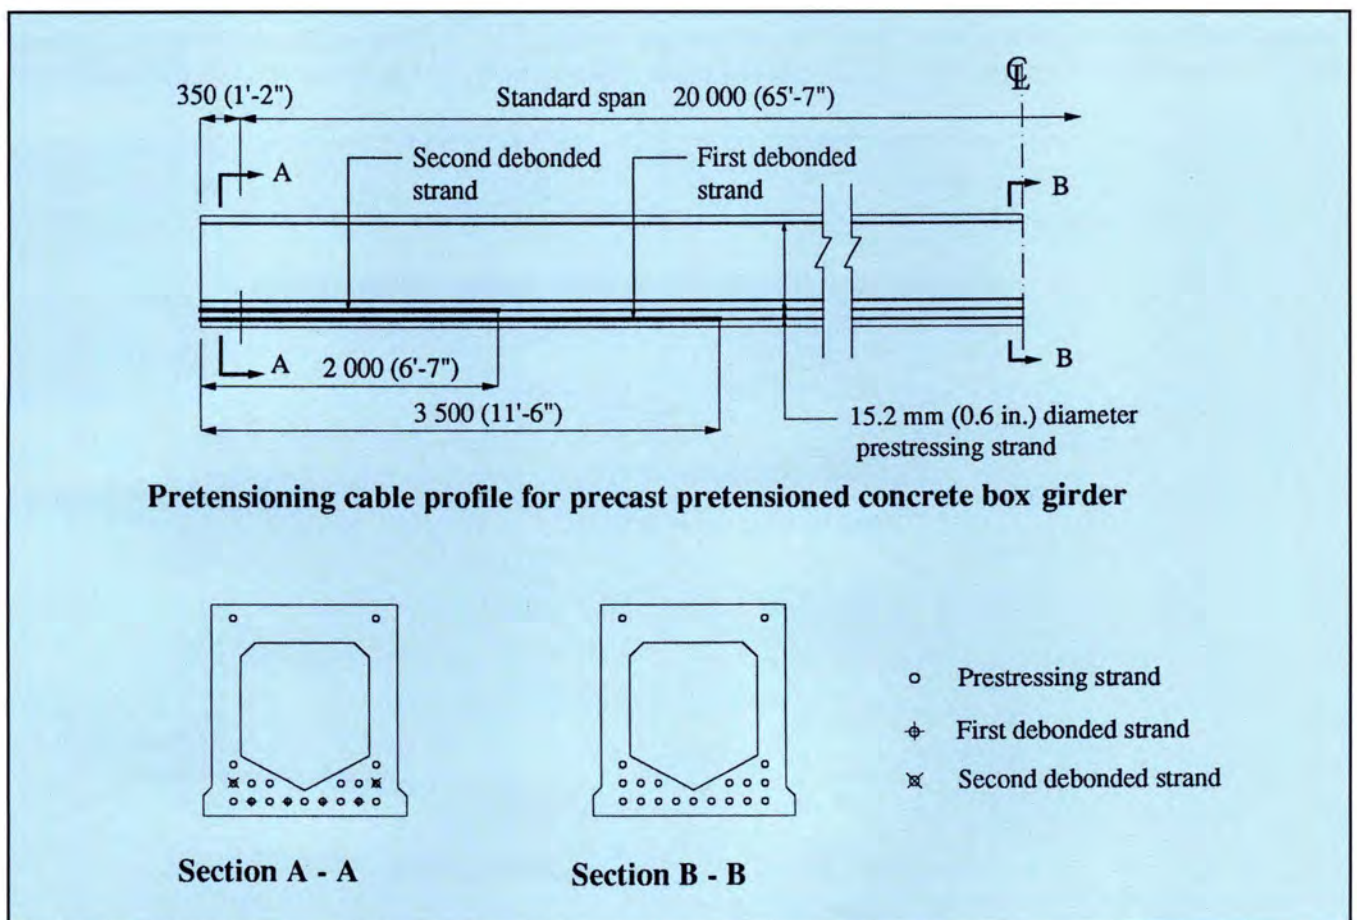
Strand arrangement in prestressed box girder (Ref. 8).
